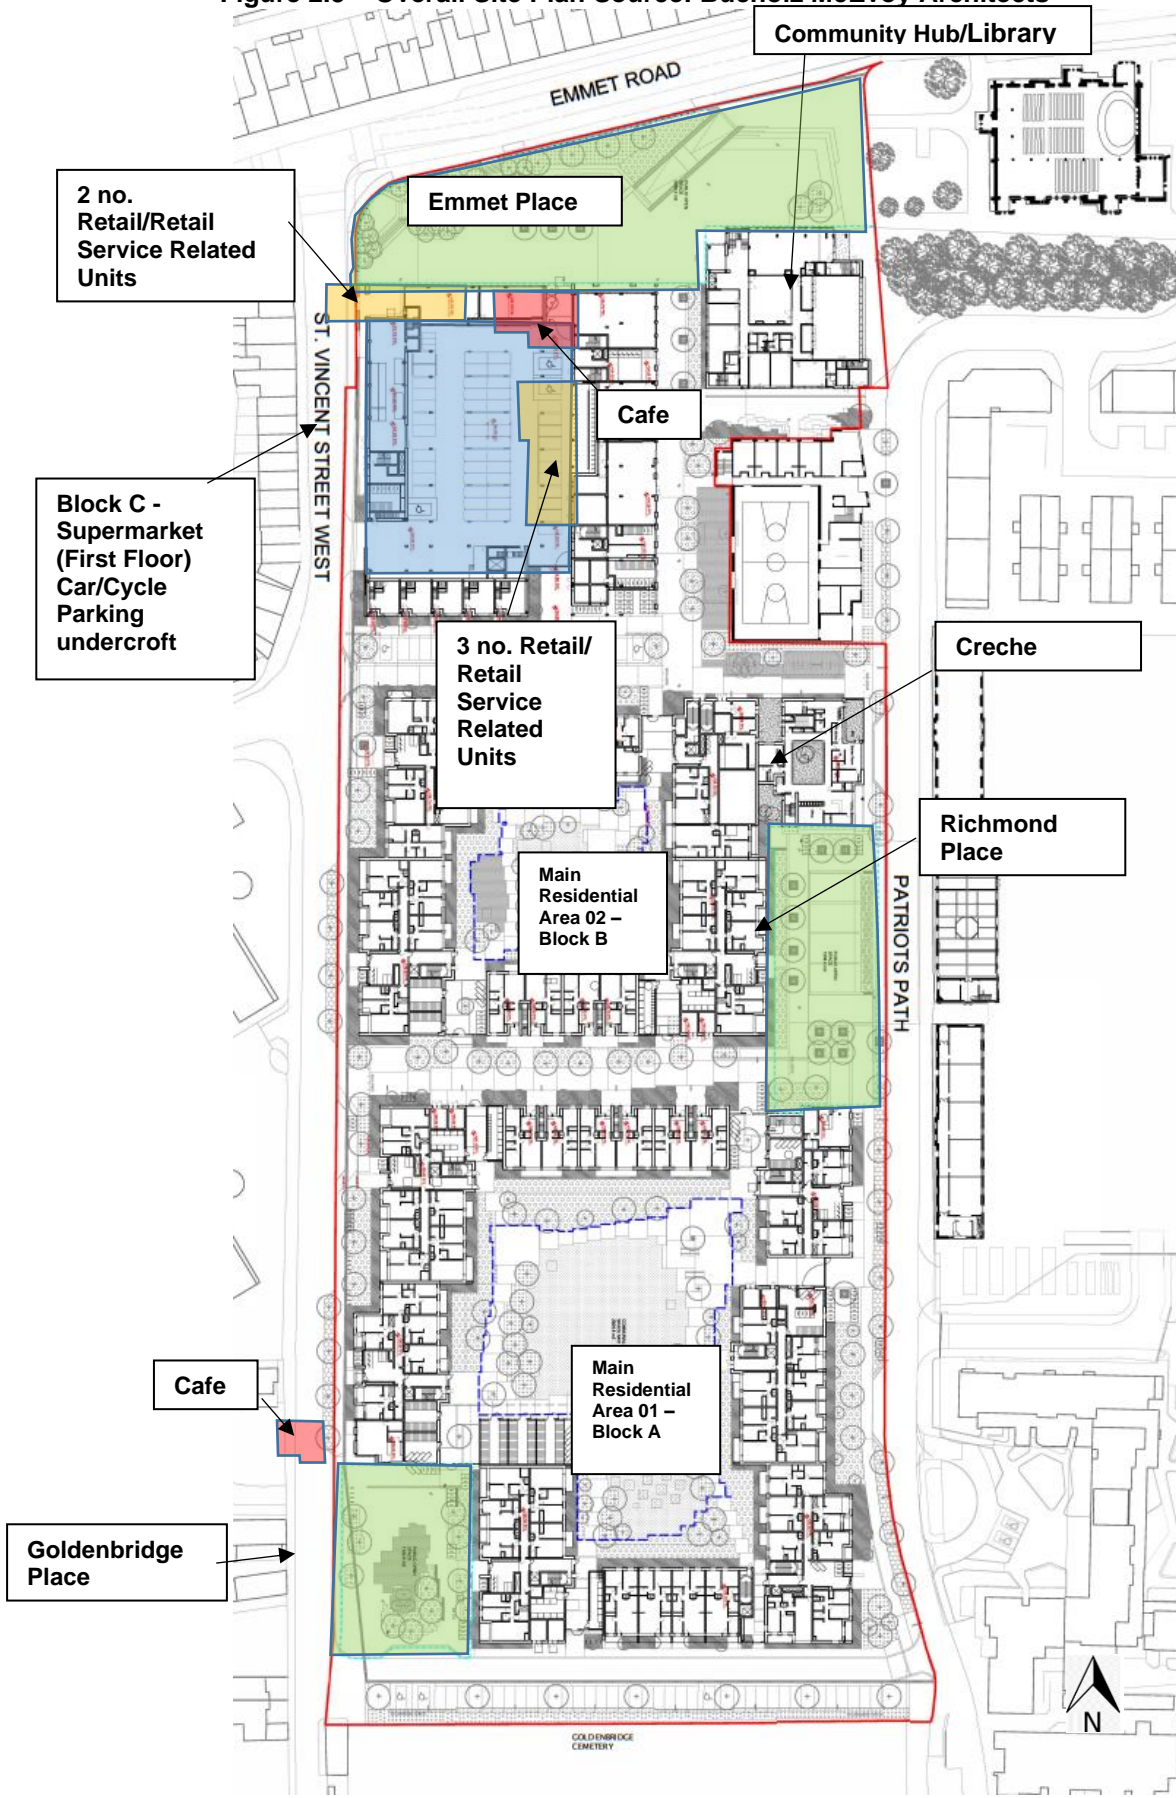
Overall Site Plan Source: Bucholz McEvoy Architects
